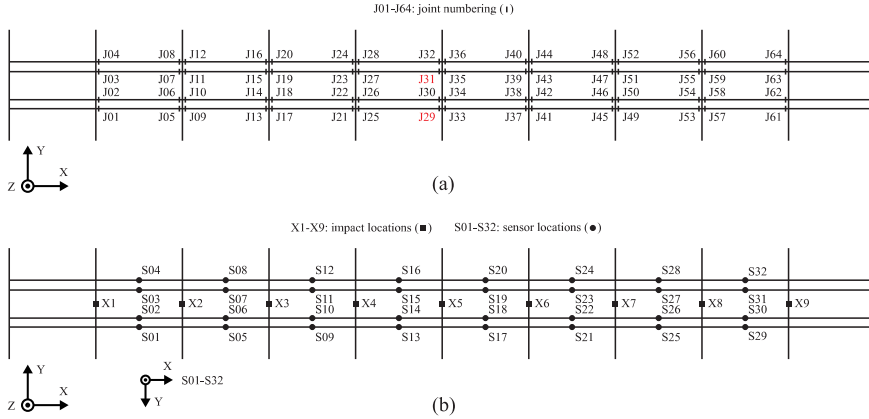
Instrumentation setup of the Hell Bridge Test Arena bridge deck (plan view). (a) Joint numbering with known damaged joints highlighted in red. (b) Sensor and impact locations.
